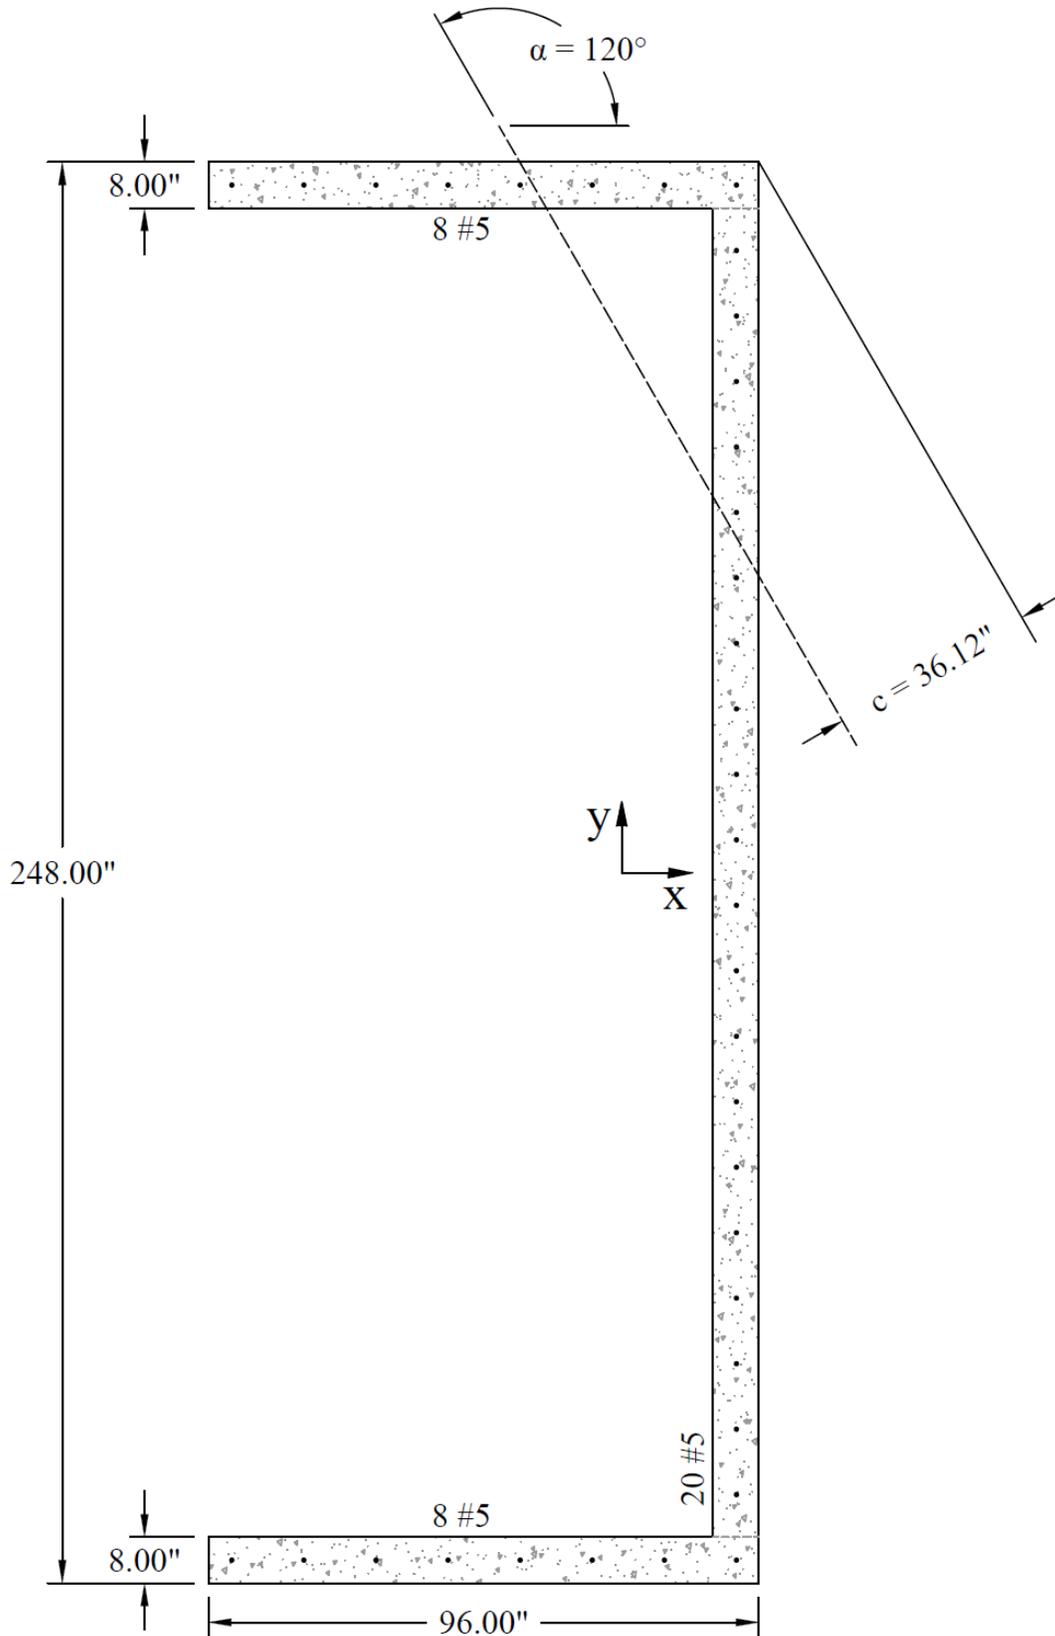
Reinforced Concrete C-Shaped Core Wall Cross-Section
